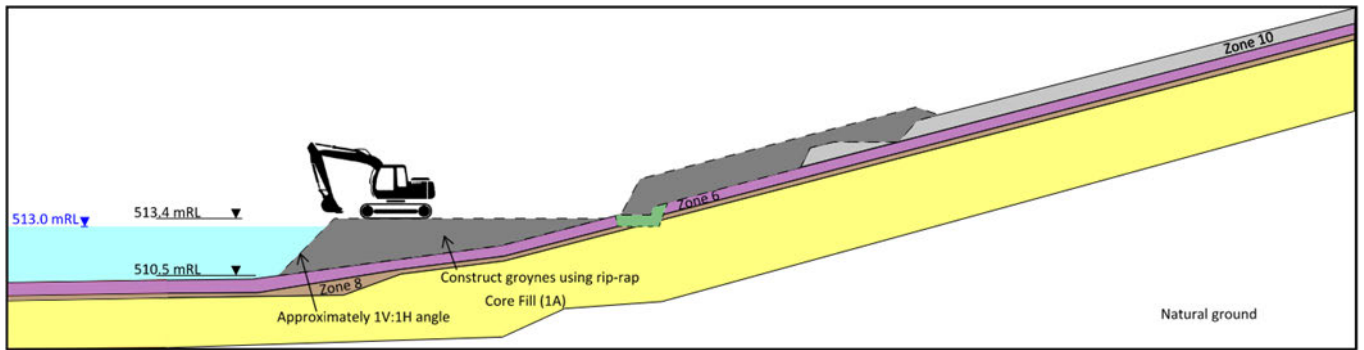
Schematic sketch – Tranche 2 – abutments – construction of groynes – Not to Scale
